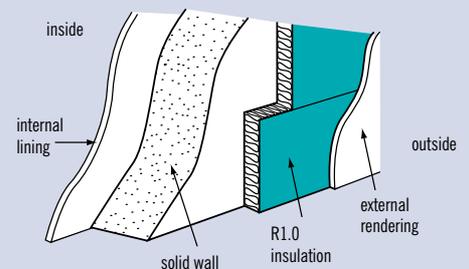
Solid masonry or concrete panel wall with external insulation (overall R value 1.4)
